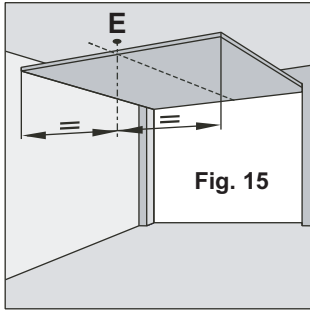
Open the door and mark the centre of the door on the ceiling (E).
